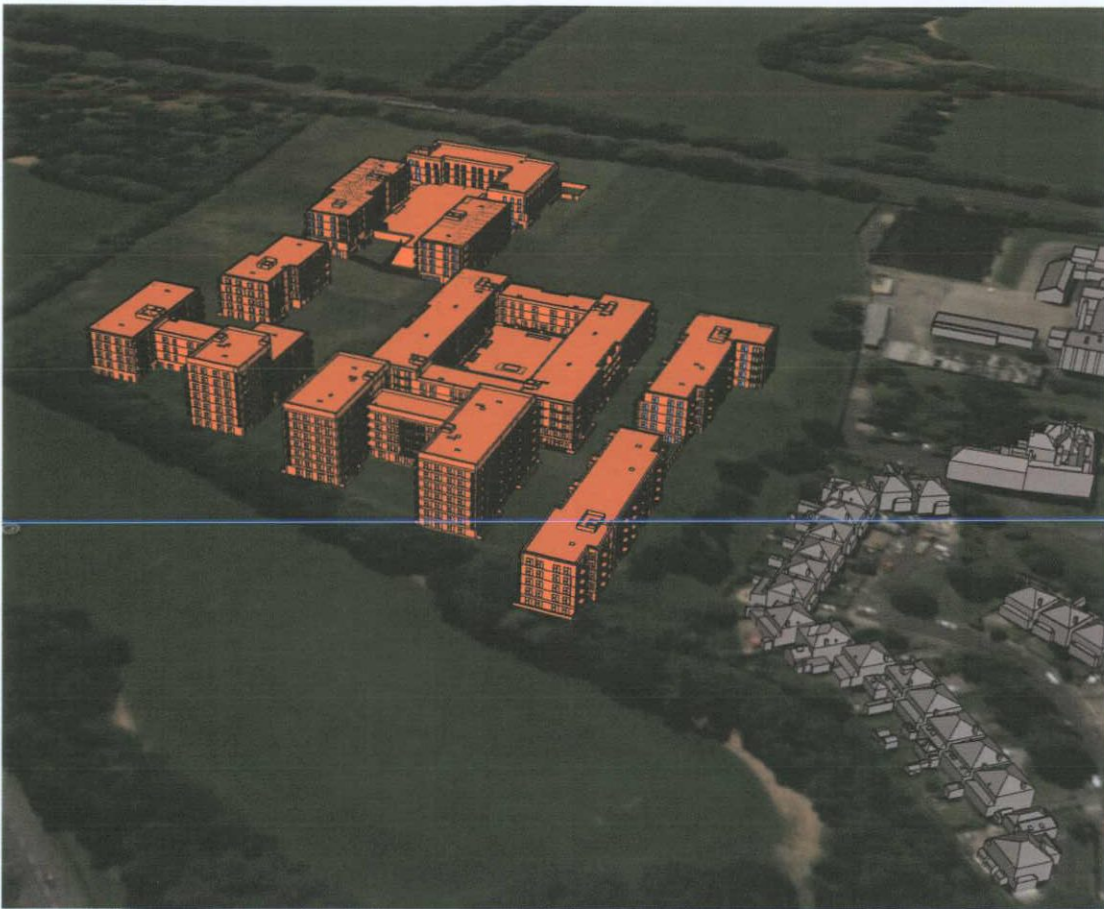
3D View of the Proposed Mixed Use Residential Development and Adjacent Buildings - North Side View
